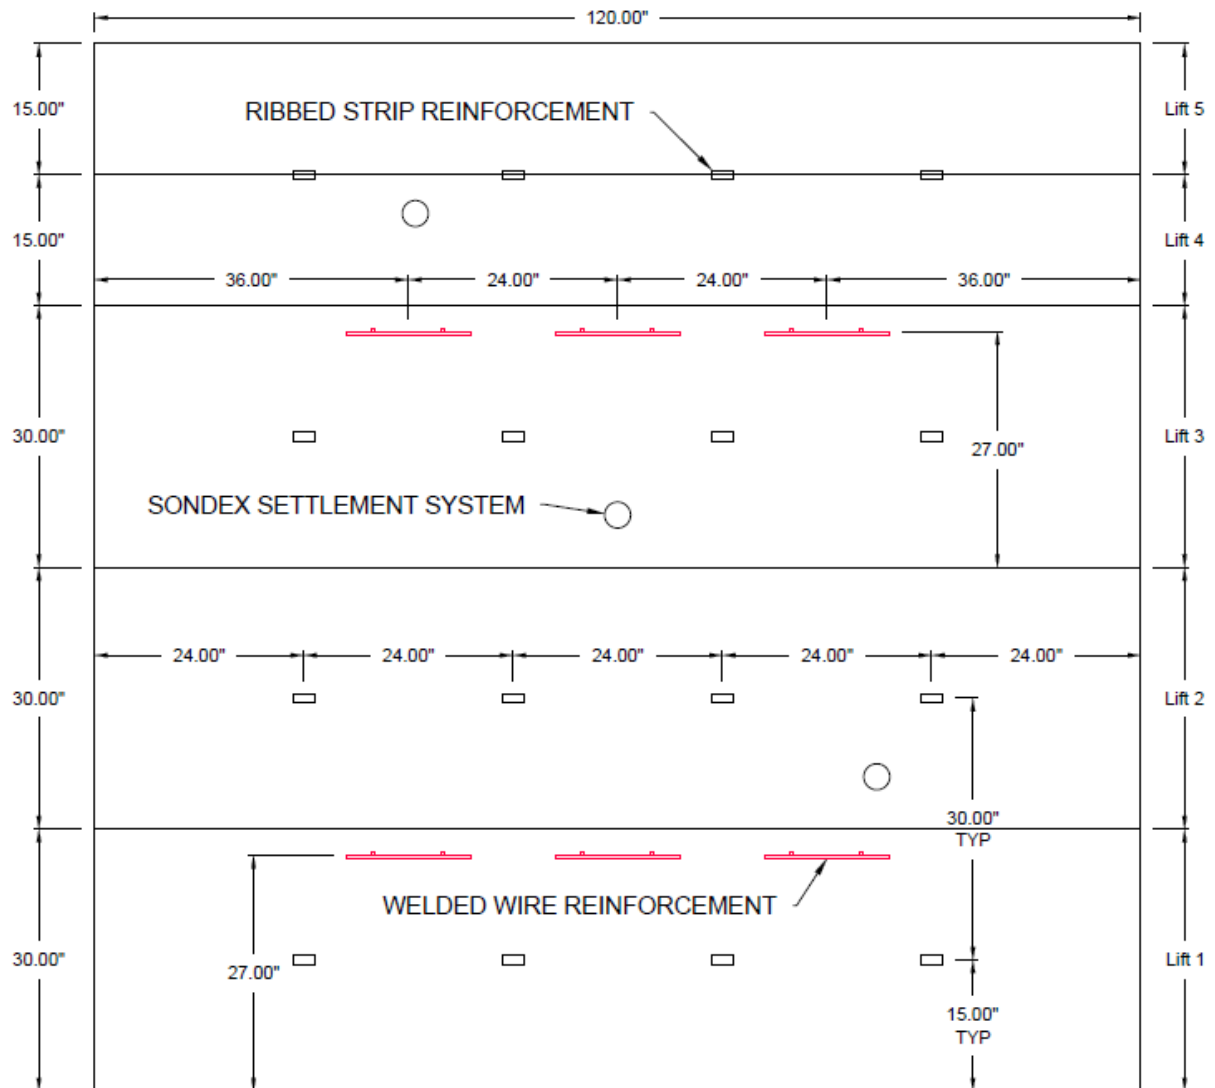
Test 6 east wall elevation view with welded-wire pull-out reinforcements in red.
